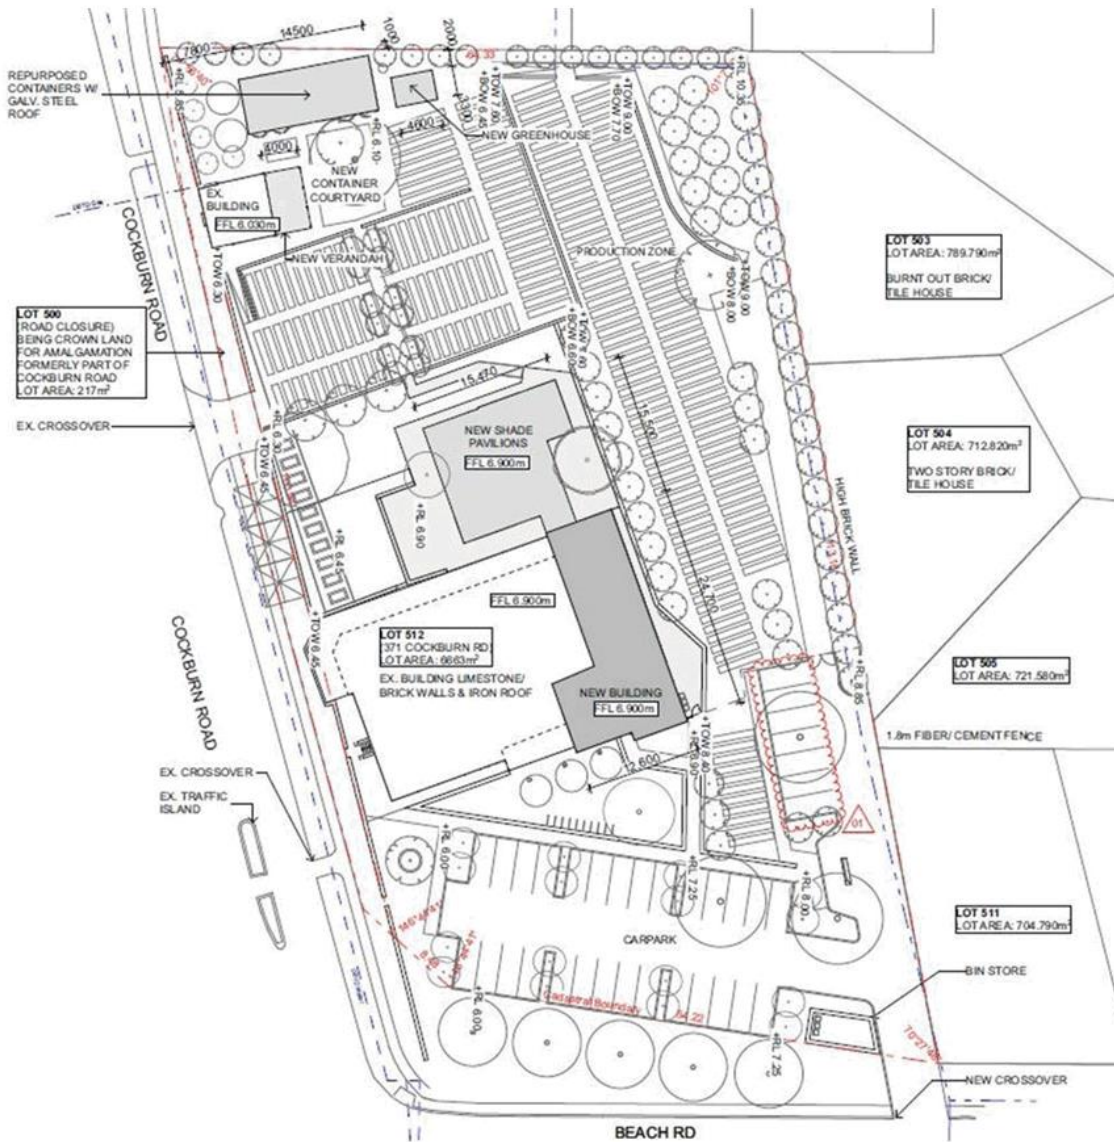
Proposed Site Plan (source Spaceagency Architects)
